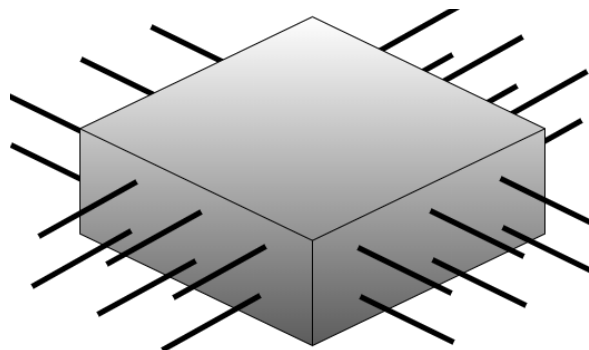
Assumed pattern of steel reinforcement in the floor structures of HB2
